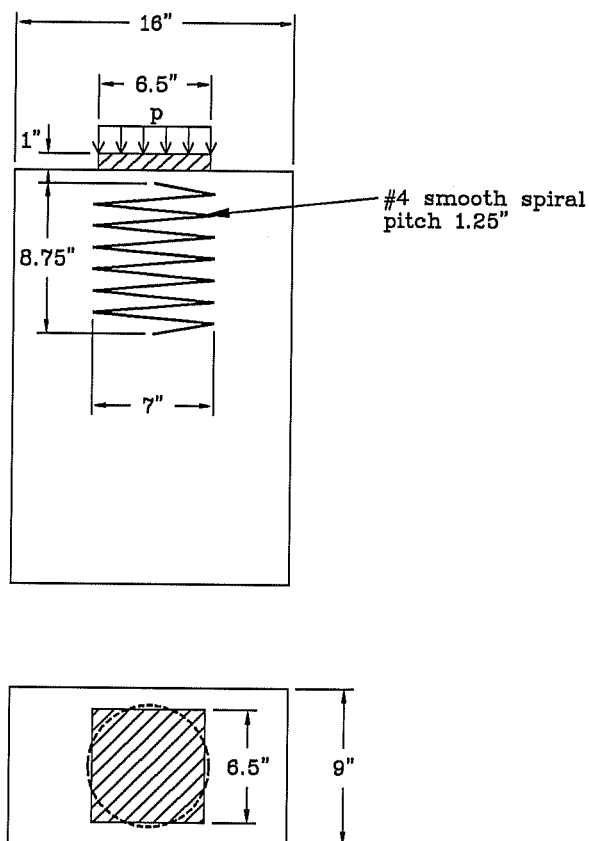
Geometry and Local Zone Reinforcement of Specimens B1-B8
